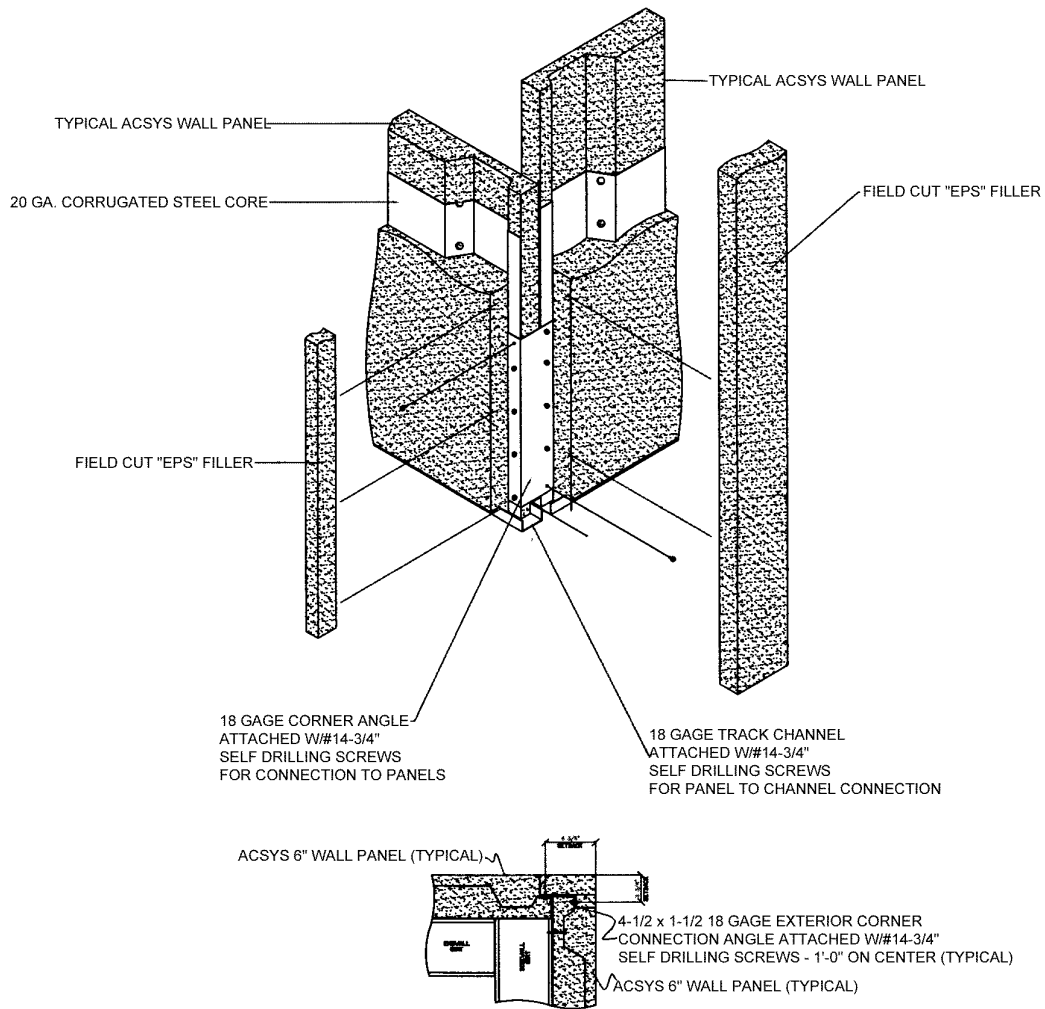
CORNER DETAIL IN ISOMETRIC
